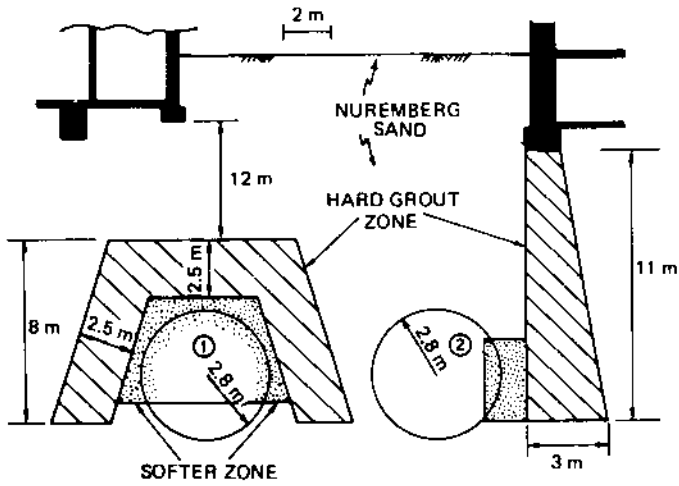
shows typical grouting zones to be used in Nuremberg above and around tunnel openings and under adjacent foundations. In Figure 19.6a, the left-hand tunnel passes directly beneath a building foundation
